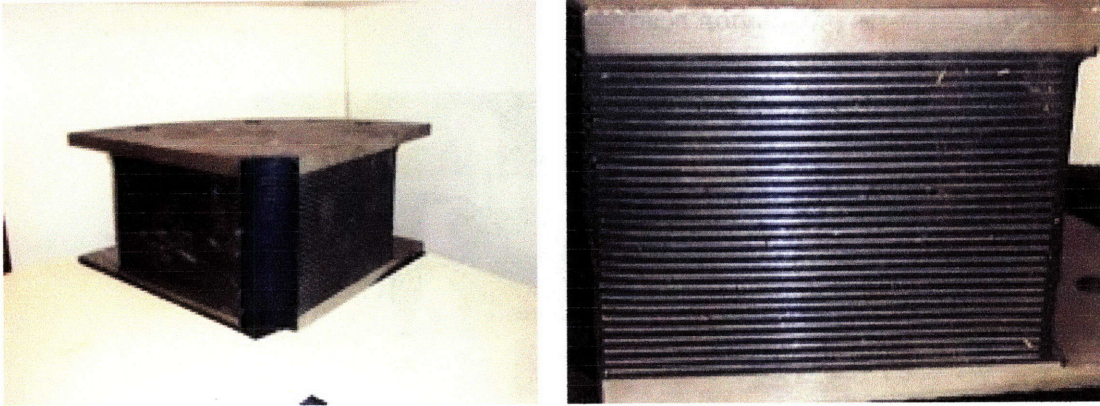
Single stage laminated rubber bearings installed in LA City Hall
